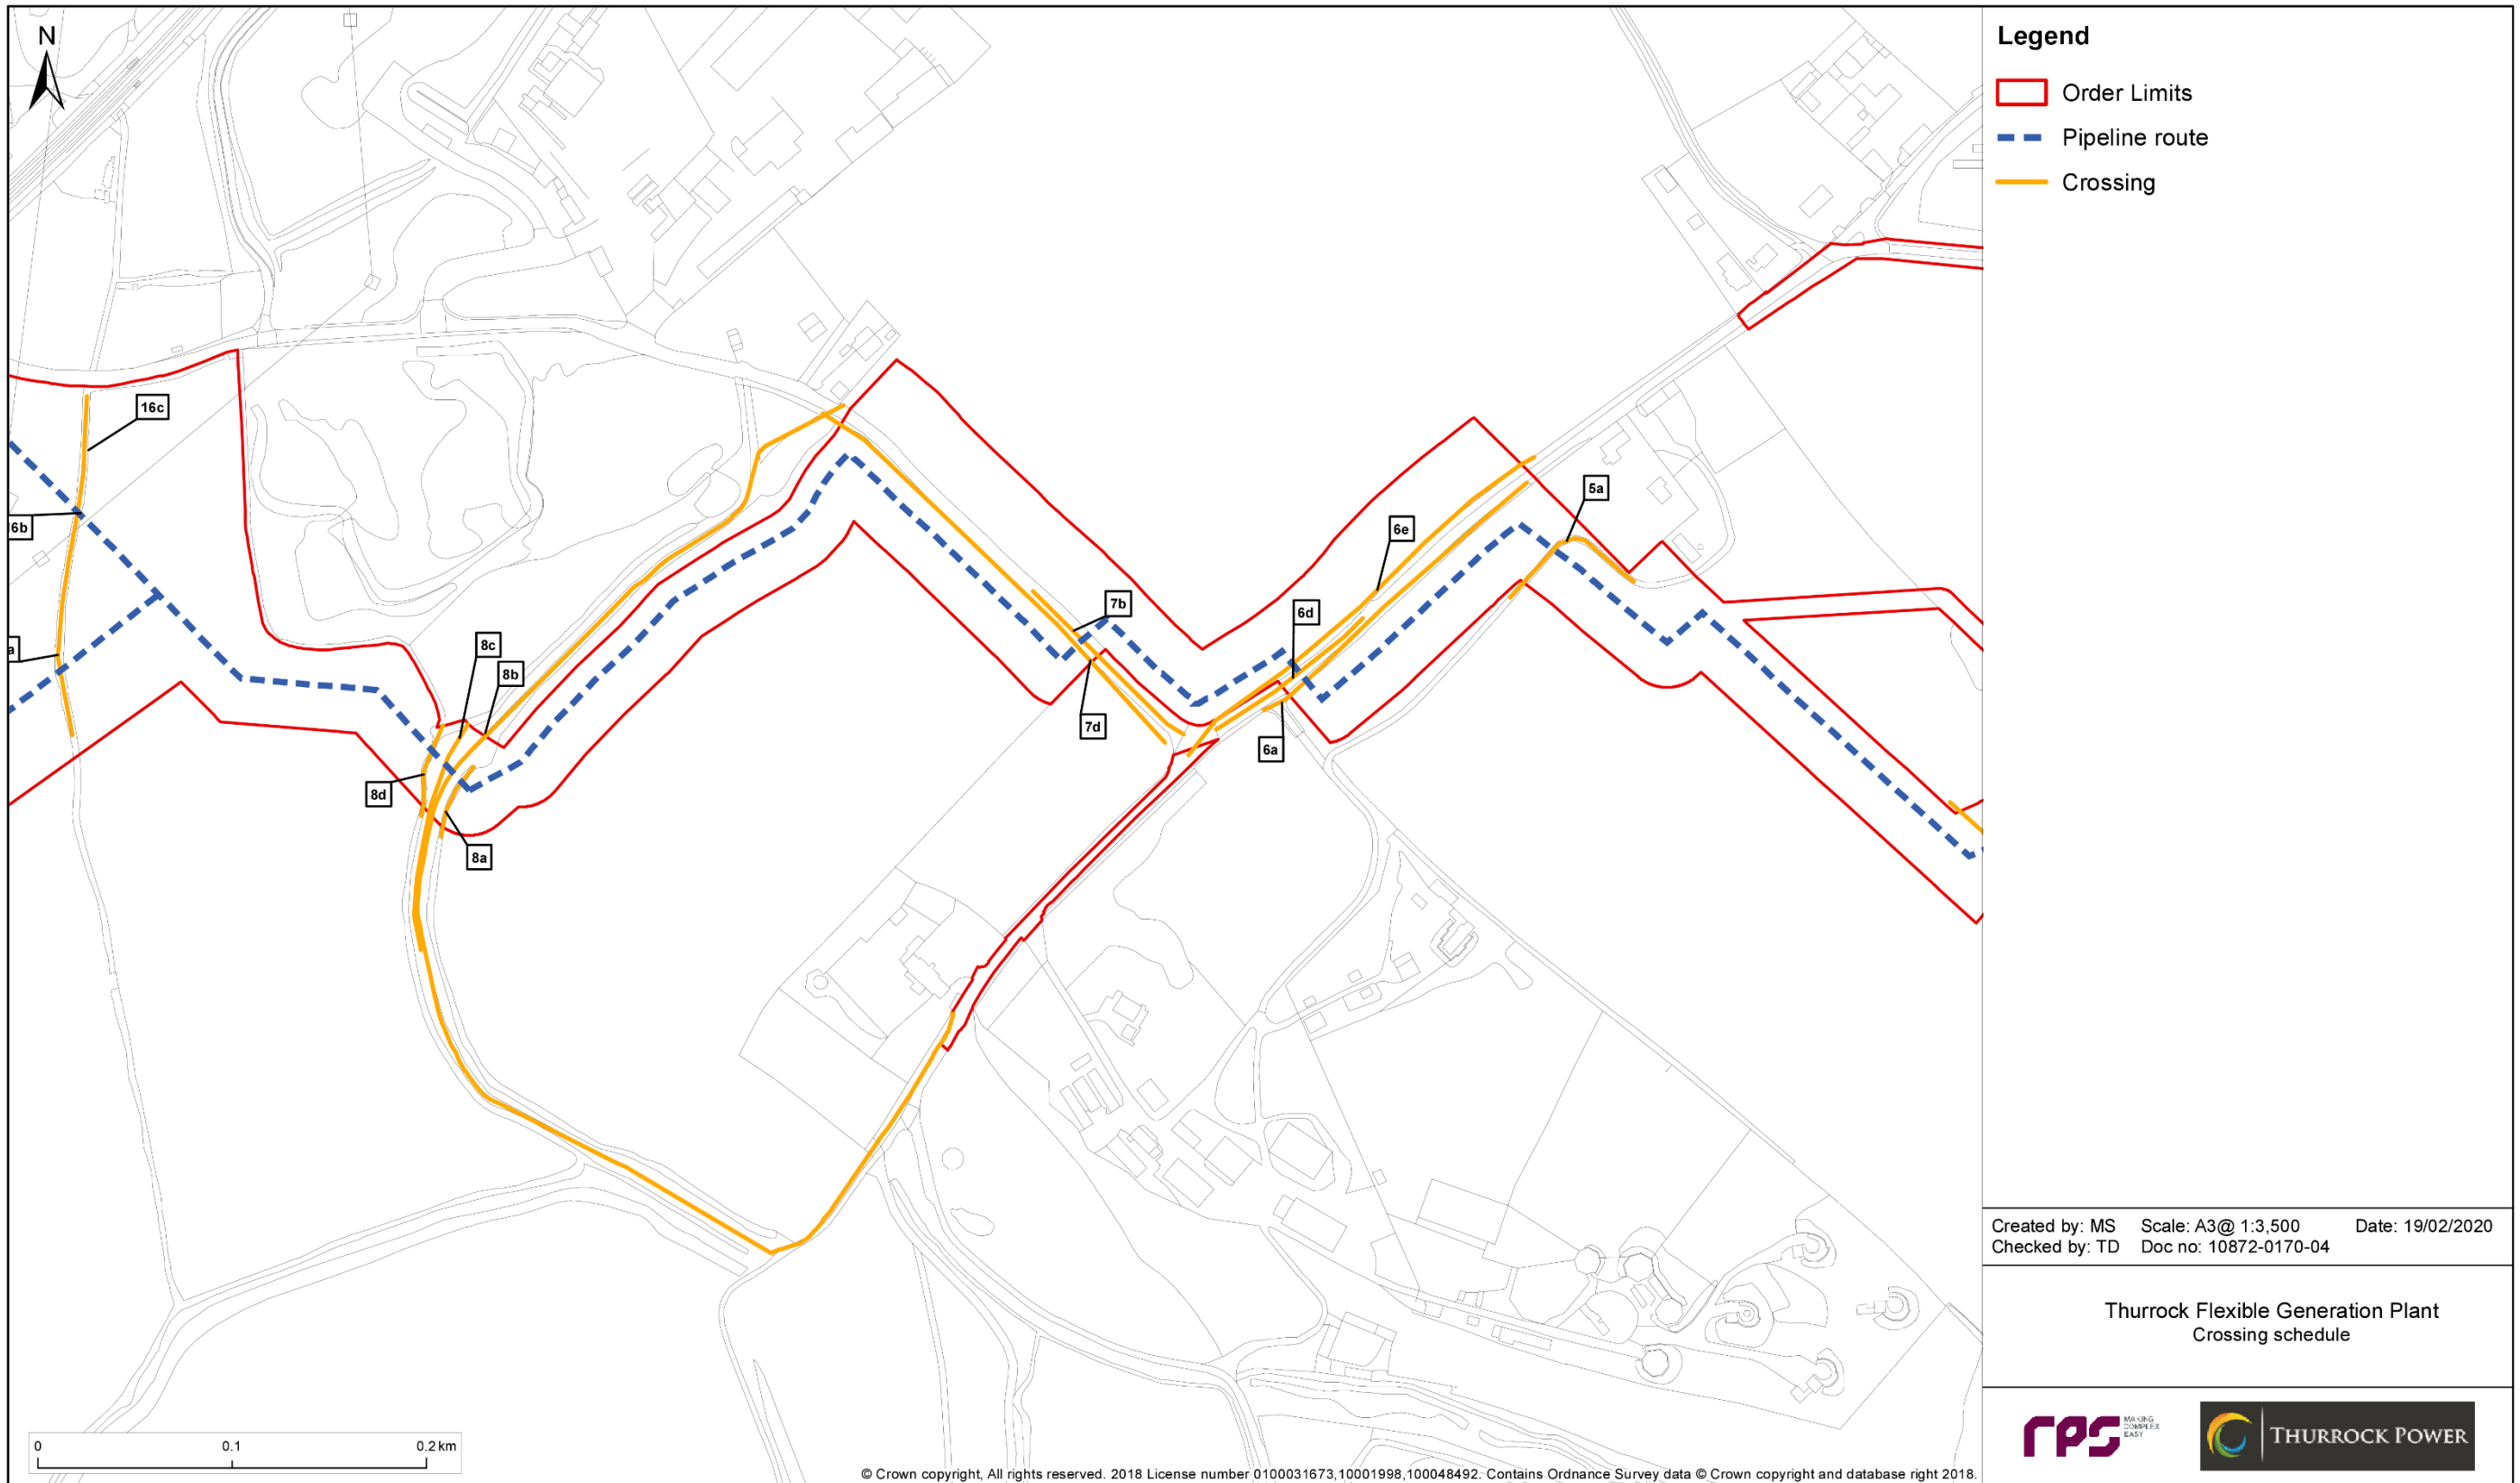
Gas pipeline, underground cable and access road crossings – sheet 2.
